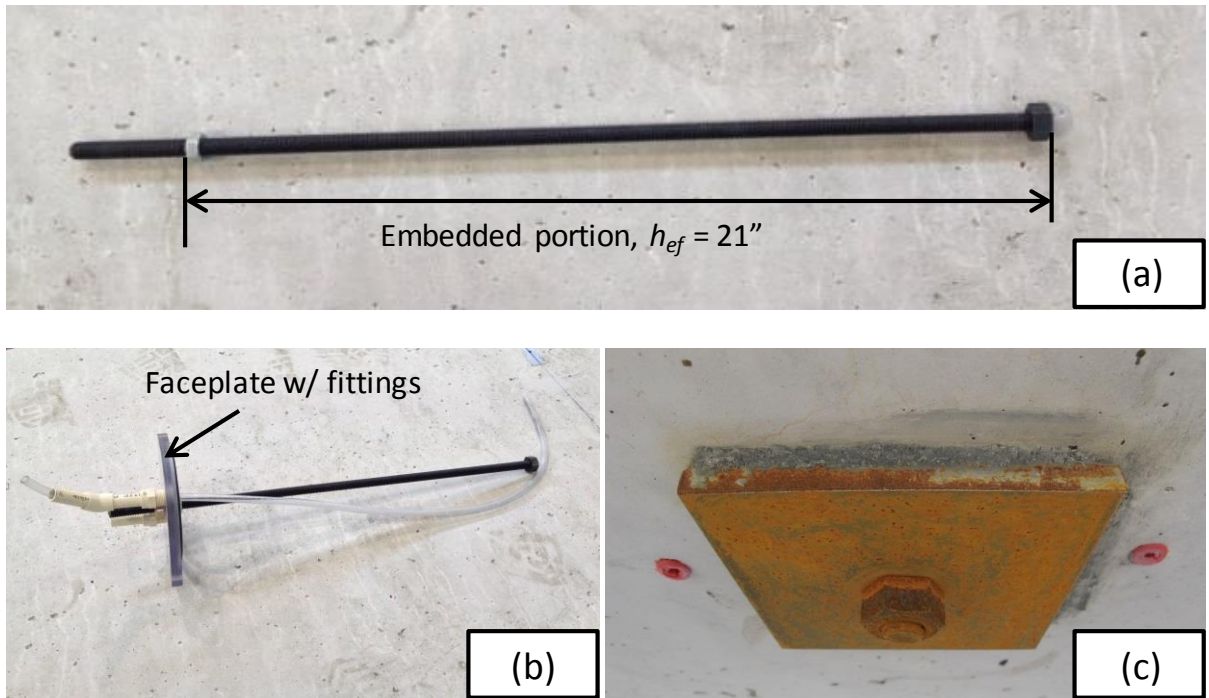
Grouted anchor system. (a) high strength rod with embedded structural nut; (b) assembly to be mounted on specimen prior to grouting (Fig. B-8); (c) installed system.
